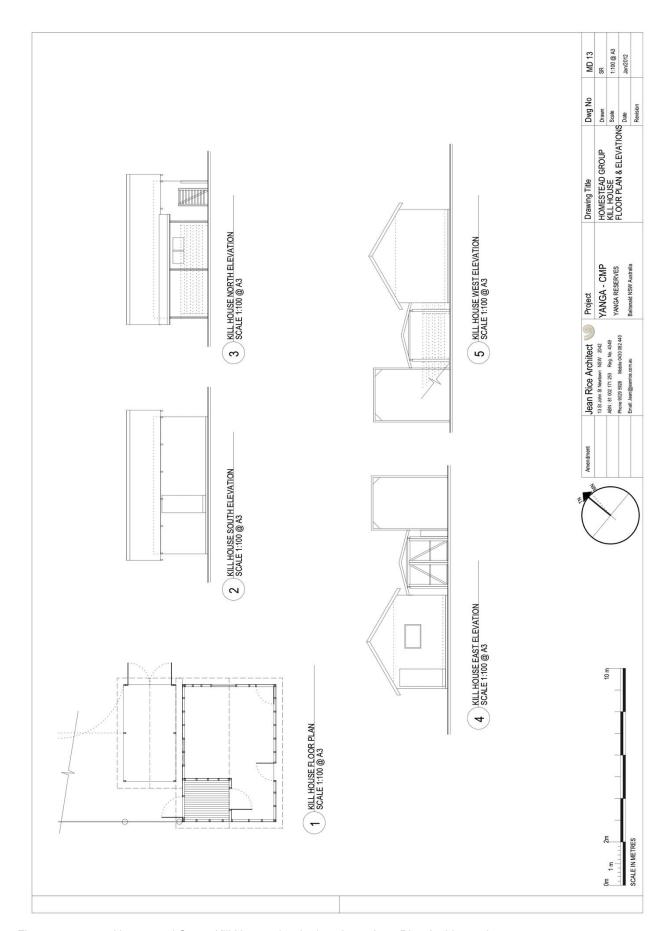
Homestead Group Kill House plan & elevations. Jean Rice Architect, site assessment 2009.
